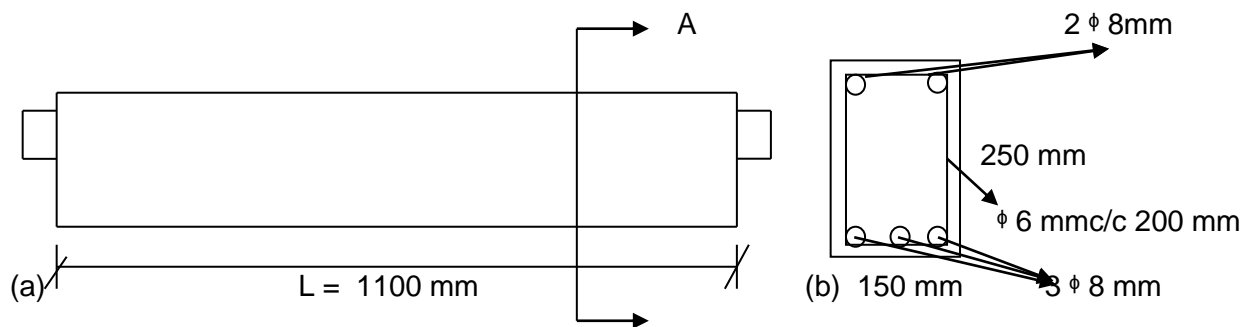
(a) - Longitudinal section of sample RC beams (b) - Cross section of sample RC beams
